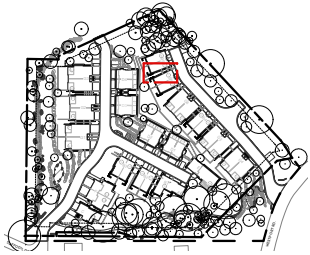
DETAIL PLAN: TYPICAL NATURALIZED PLANTING CONCEPT
